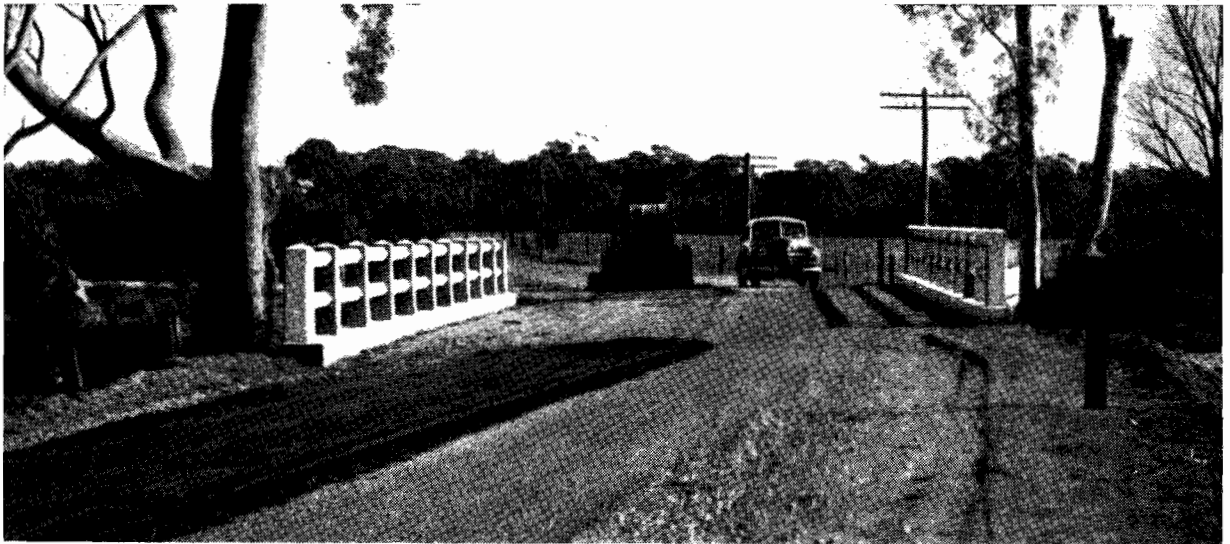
Tullaroop Shire : Natte Yallock Road, New bridge at Alma replacing worn out narrow bridge.
